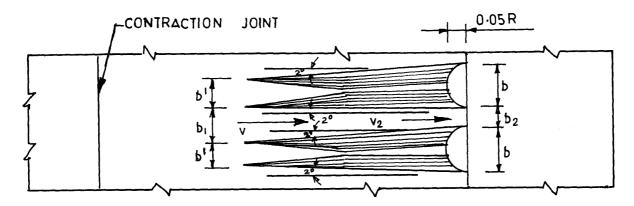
Plan Showing Teeth of Slotted Roller Bucket
